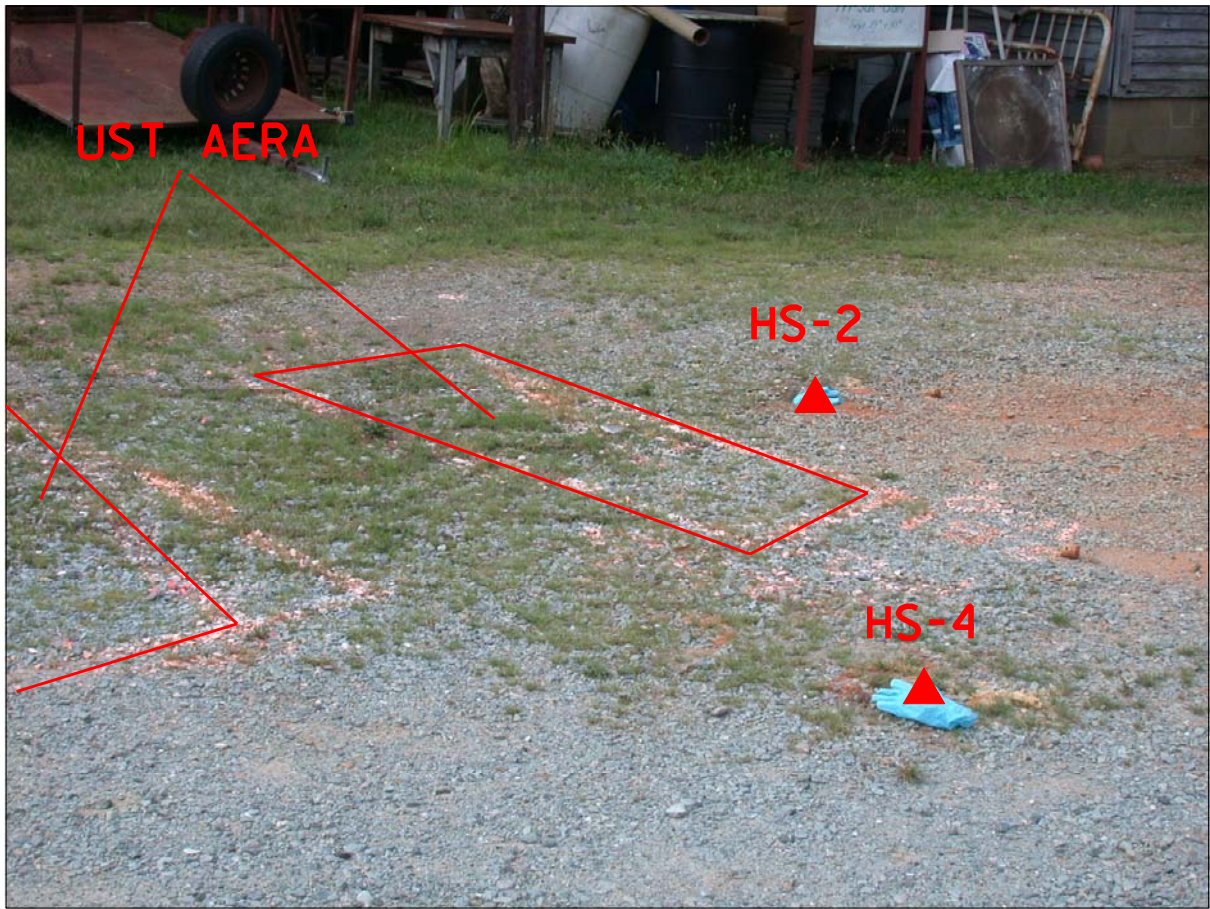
BORINGS AT HARRIS PROPERTY LOOKING SOUTH FROM STREET
